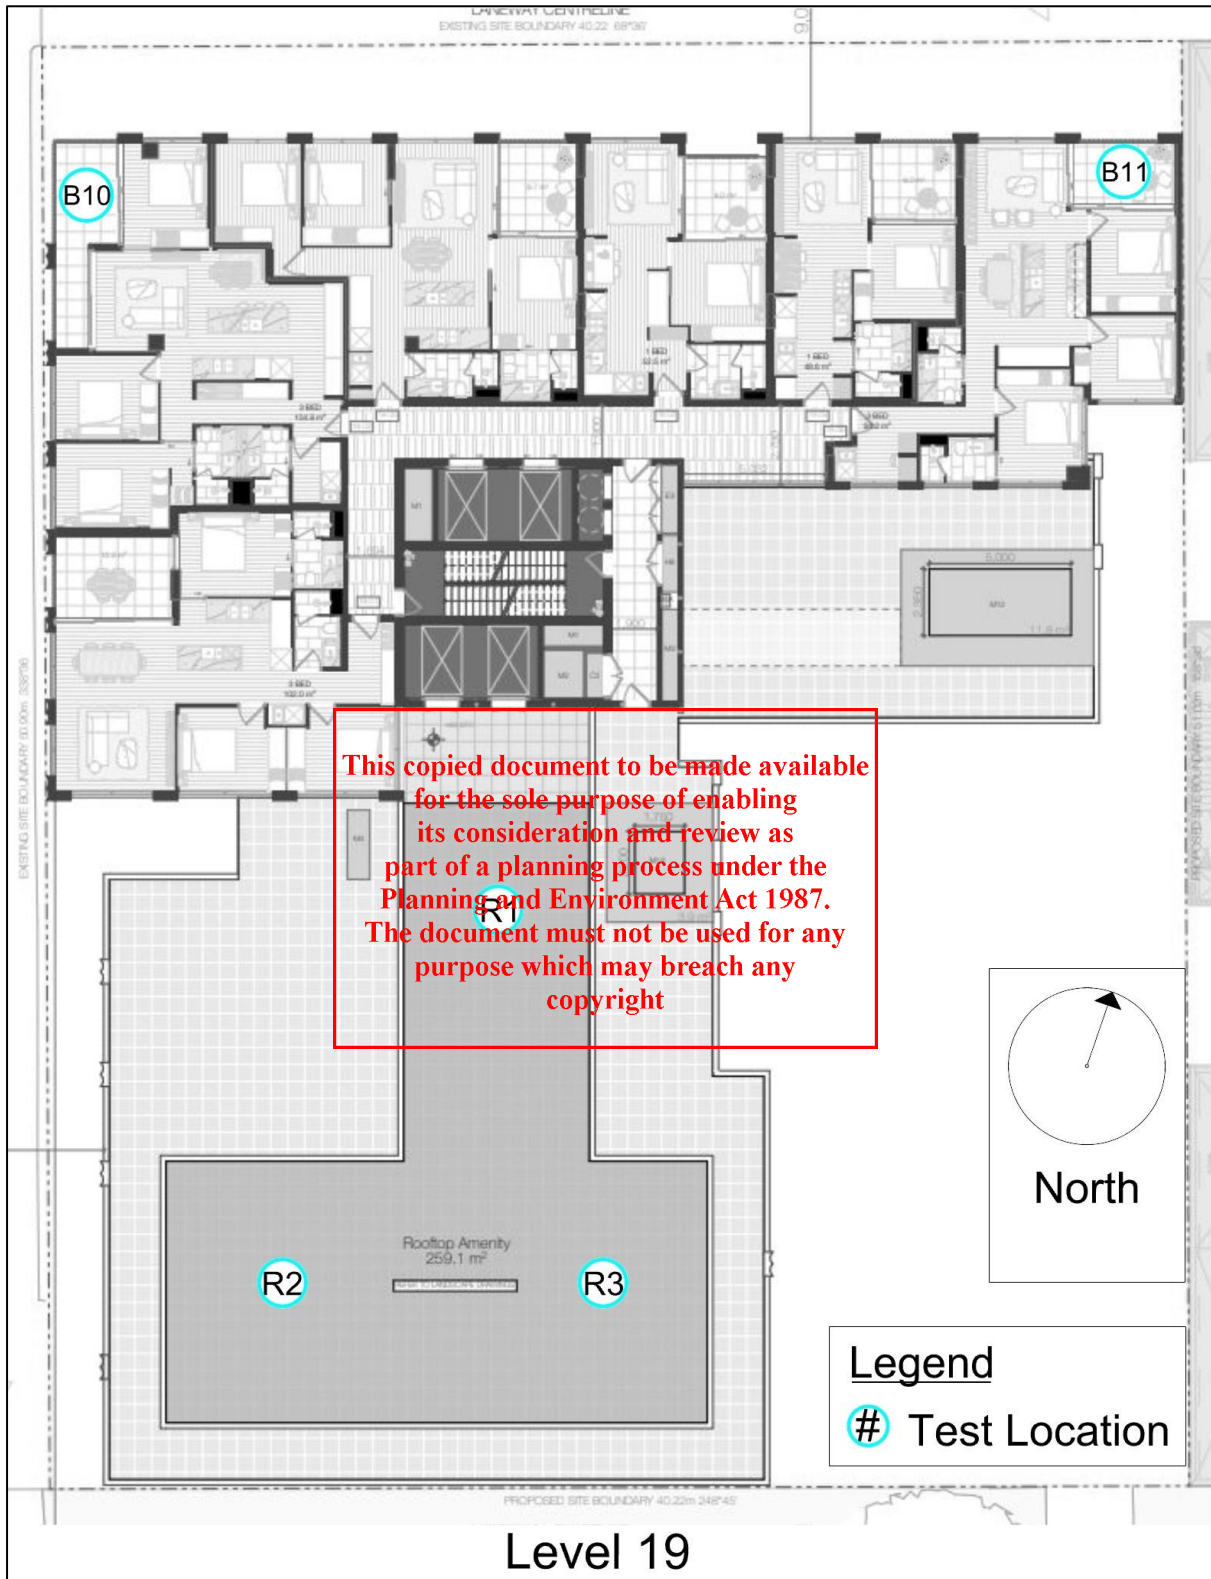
Test Locations on Level 19 of the proposed 60-70 Park Street development.
